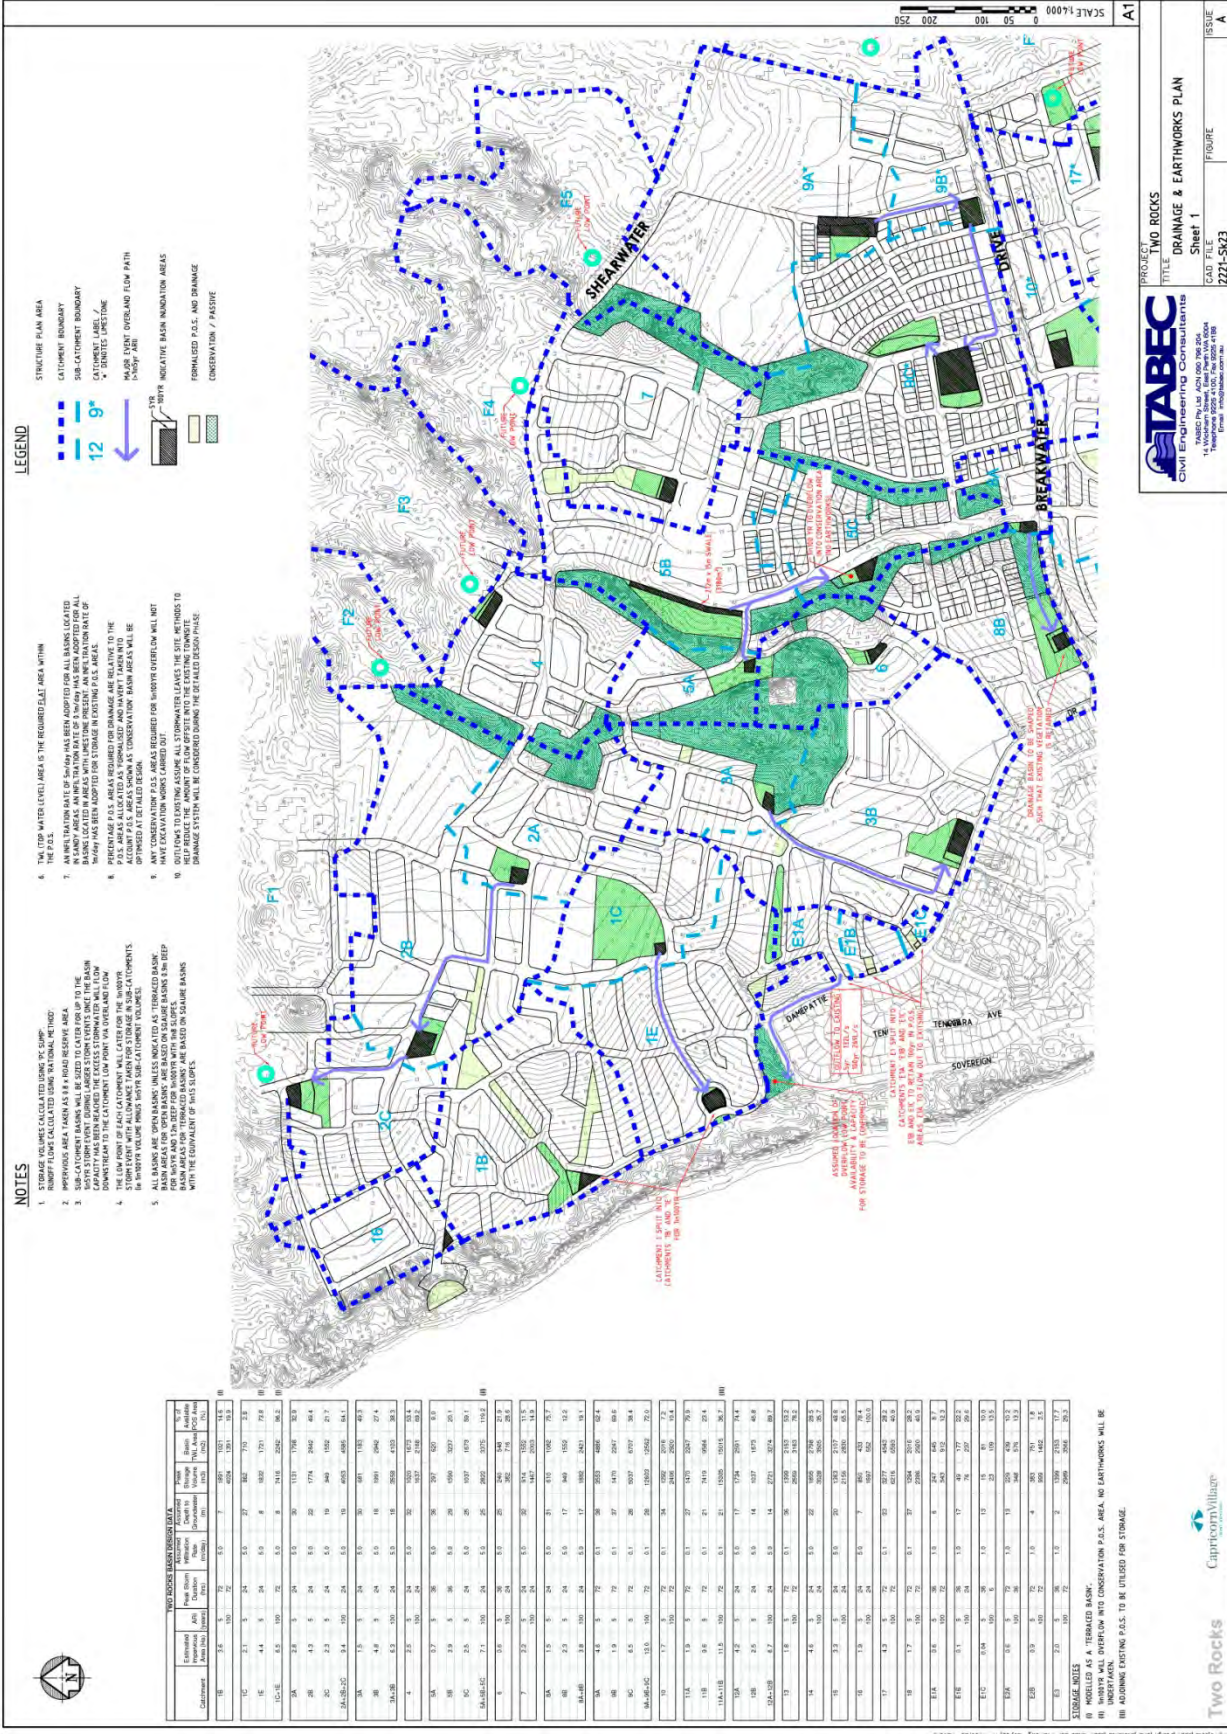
PRELIMINARY DRAINAGE PLANNING AND EARTHWORKS [SOURCE: TABEC]
